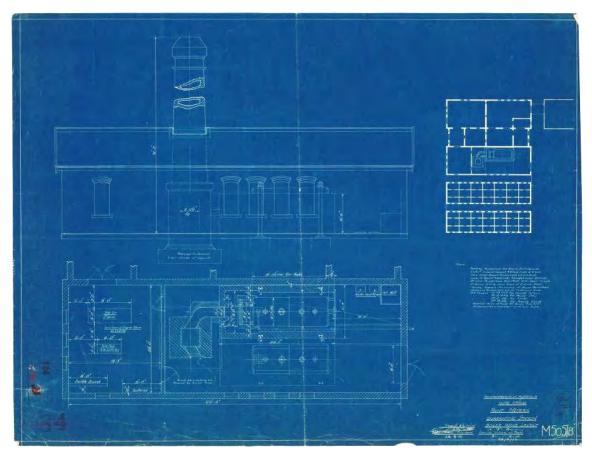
Point Nepean Quarantine Station. Boiler House Layout. Construction Drawing. June 1916.
